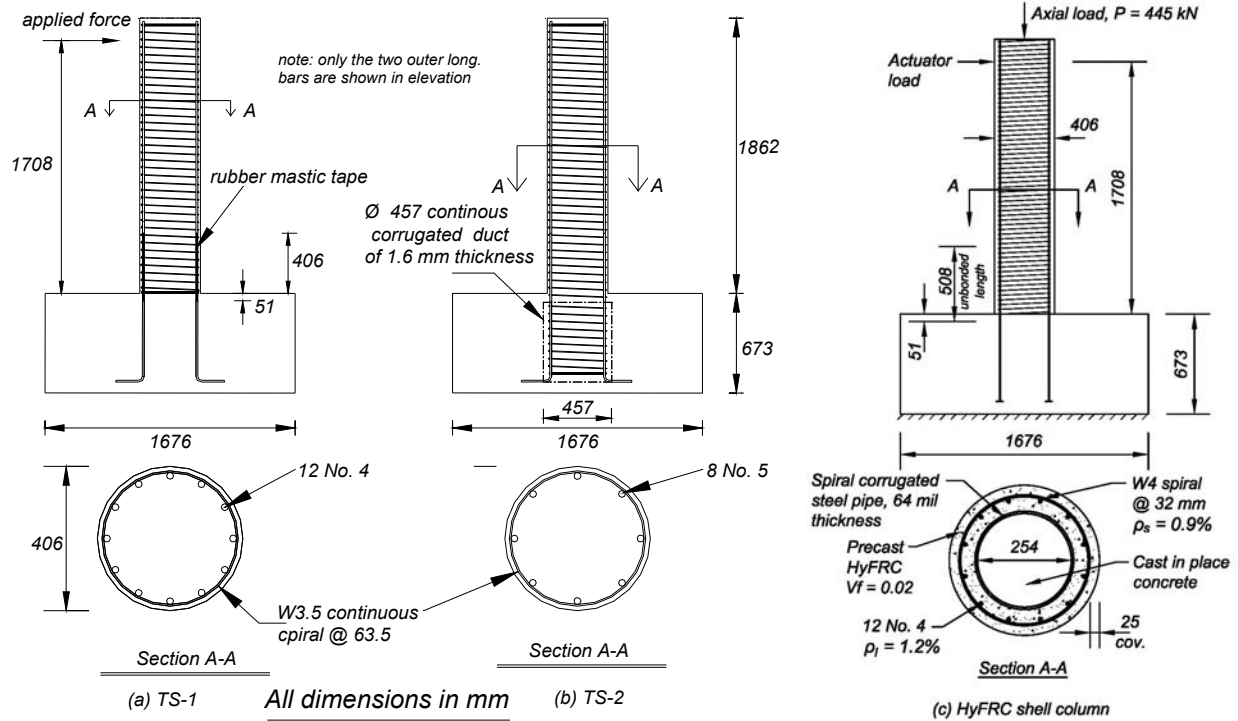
HyFRC column elevations and cross sections; (a) TS-1, (b) TS-2 (Panagiotou et al. 2014), and (c) HyFRC shell column.
